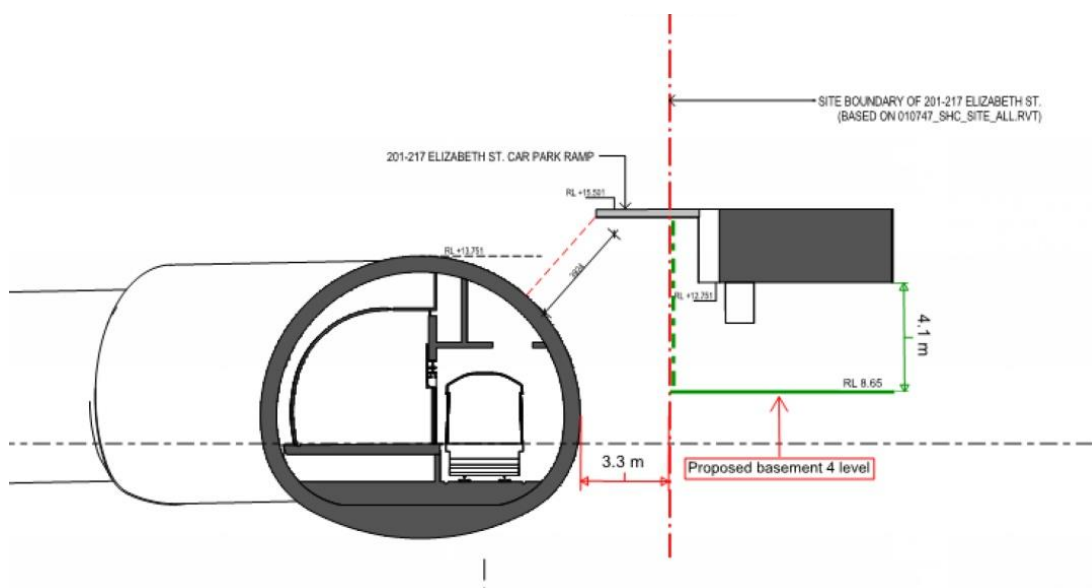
Indicative cross section through the development site and future Metro Station cavern
